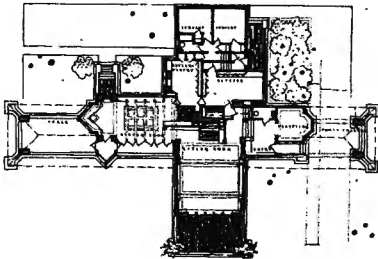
F.L.L. Wright, Willitts house, 1902. Ground floor plan.
